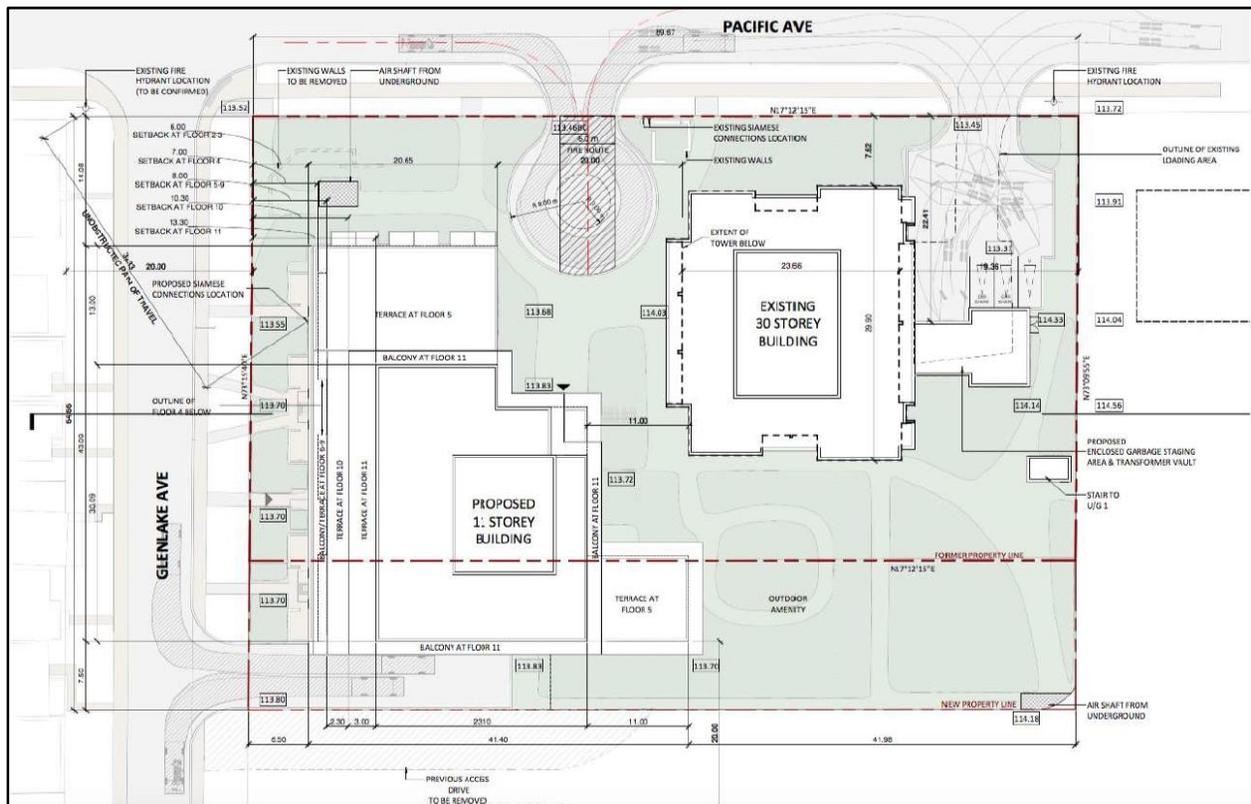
Proposed Site Plan for 299 Glenlake Avenue site (SGL Planning Rationale Report, 2019, p. 10)
